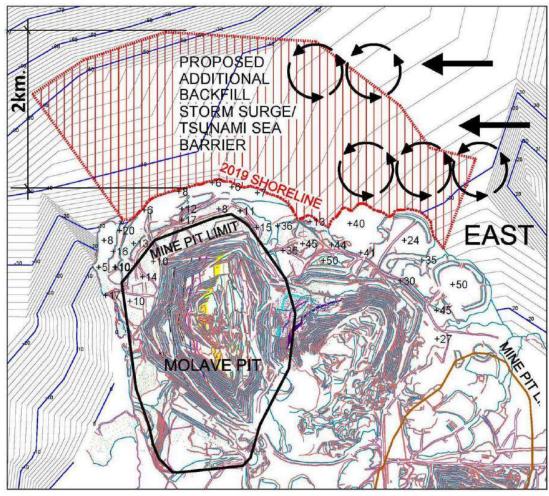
1.5-KM TO 2.0-KM-WIDE ADDITIONAL BACKFILL AREA BEYOND THE 2019 MOLAVE MINE NORTHERN SHORELINE WITH A MINIMUM +10.0 MASL ELEVATION TO ACT AS STORM SURGE/TSUNAMI BARRIER.
